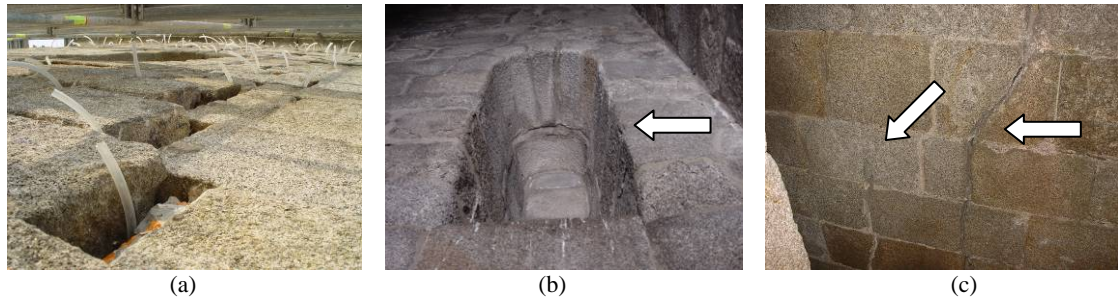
Details of the cracks in the towers: (a) cracks up to 0.20 m width in the South façade / South tower; (b) typical active cracks parallel to the walls at the openings; (c) vertical cracks at the base of the North tower.
